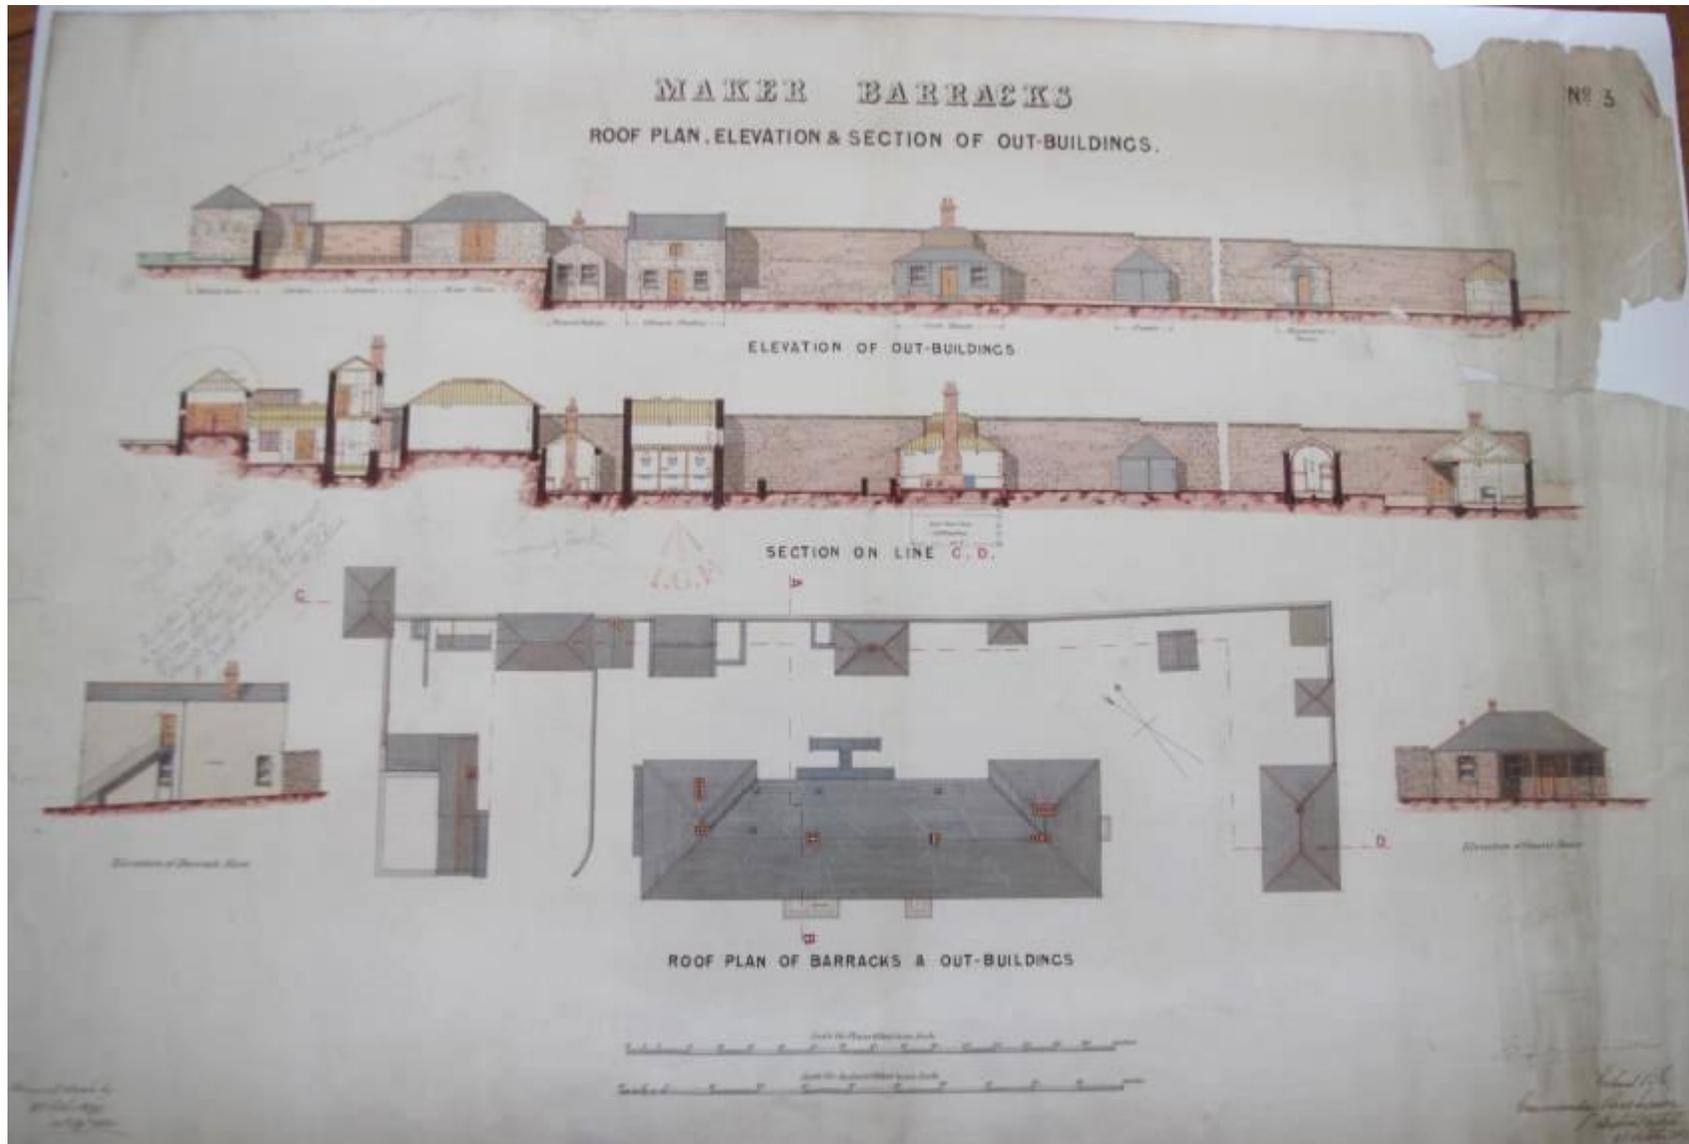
Plan of Barracks Complex 1882 (WO 78/2975).
